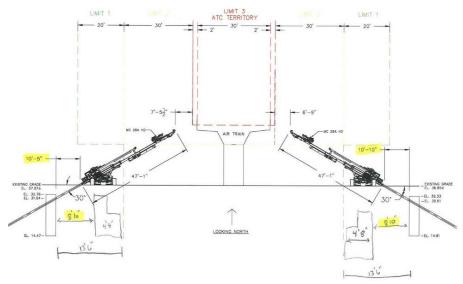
Tieback installation equipment was evaluated at each location to determine the ideal tieback angle and confirm clearances to the AirTrain above. Pictured is the 109th Avenue Bridge, looking north.
